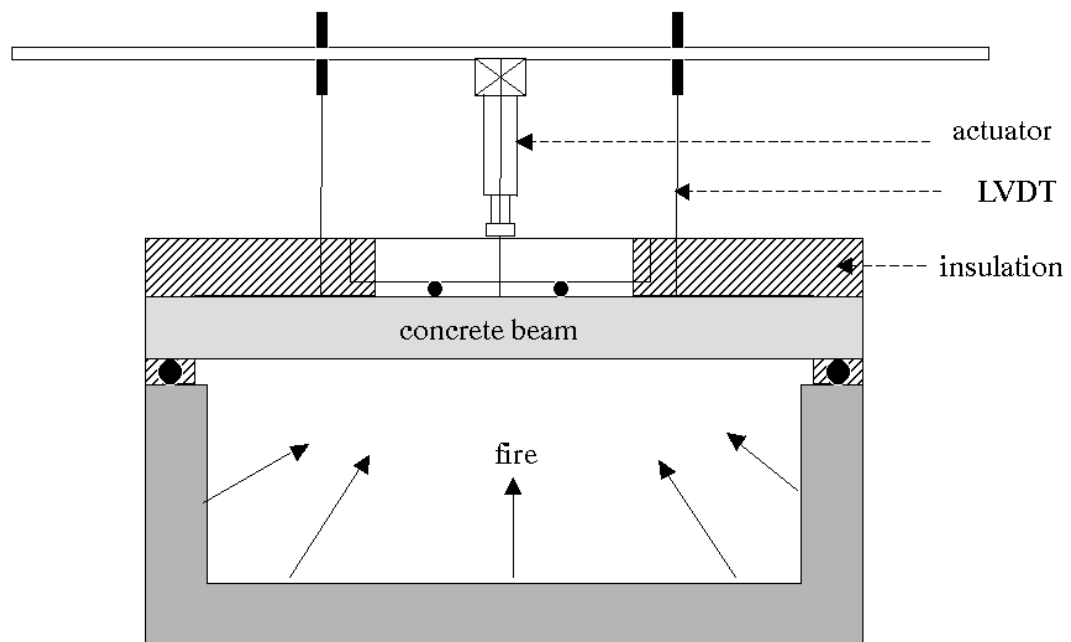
Set-up for fire test on concrete beam (tests conducted by Kim [37])
